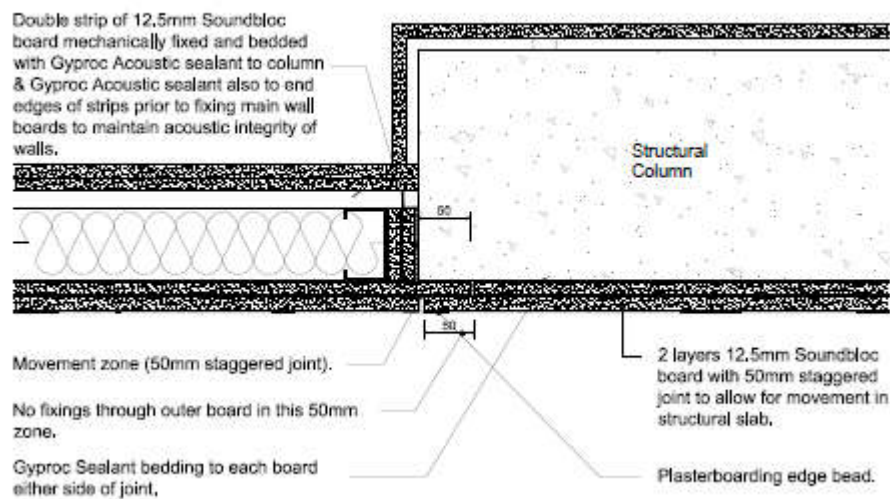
Movement Joint - In Hard Plasterboard Fixing to Concrete Column/Wall (Not to Scale)
